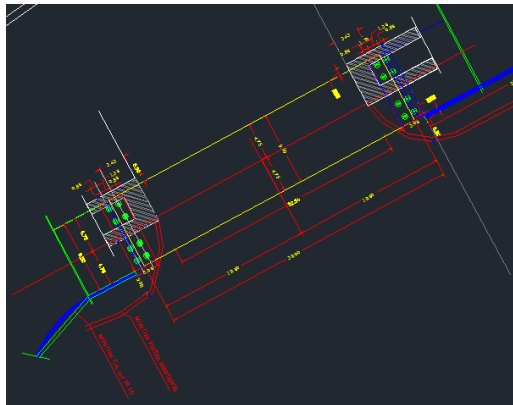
Fiume di Mare Bridge: plant scheme with supports on spurs and retaining walls
